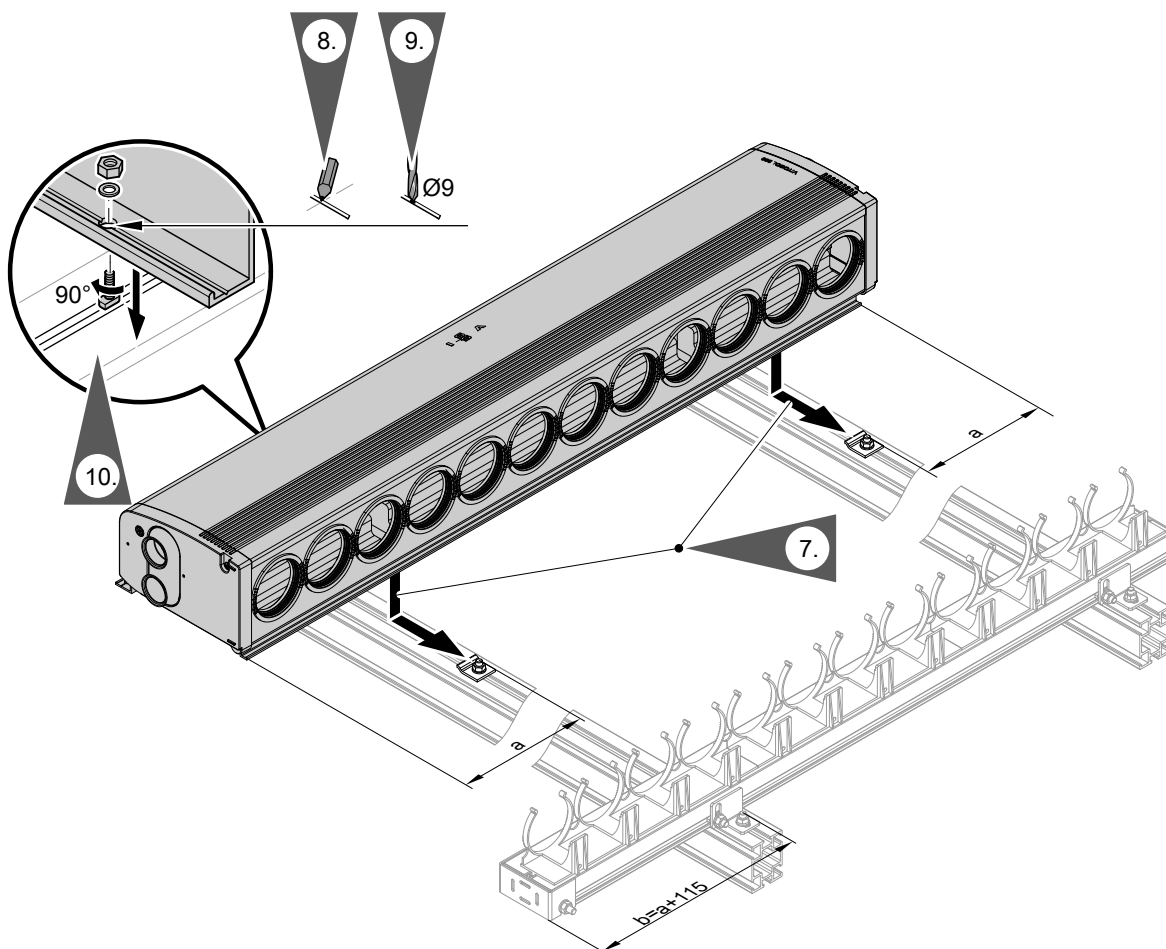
Dimension *a* results once the header casing is placed on the mounting rails
